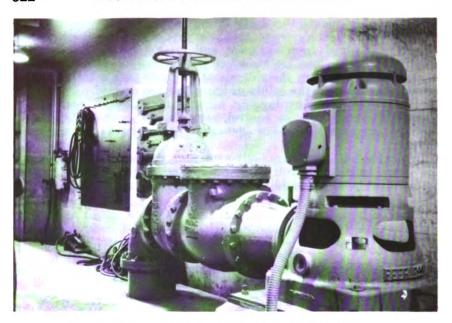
Well-type draft tube unwatering pump-Chatuge.
